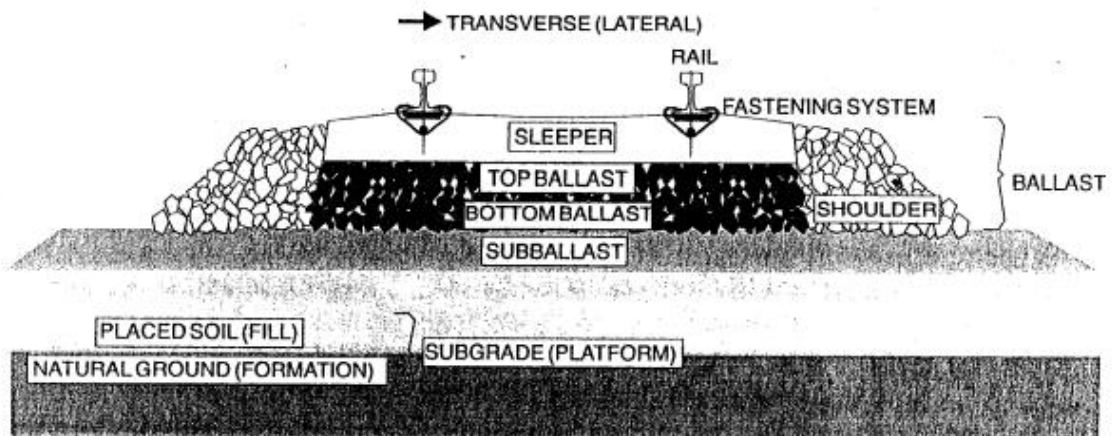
Cross-Sectional View of a Typical Rail Track [8]
